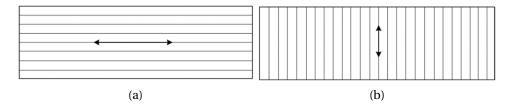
Different types of CLT billets: (a) Longitudinal panel, typically used for floor and beams, and (b) Transverse panel, typically used for wall panels
